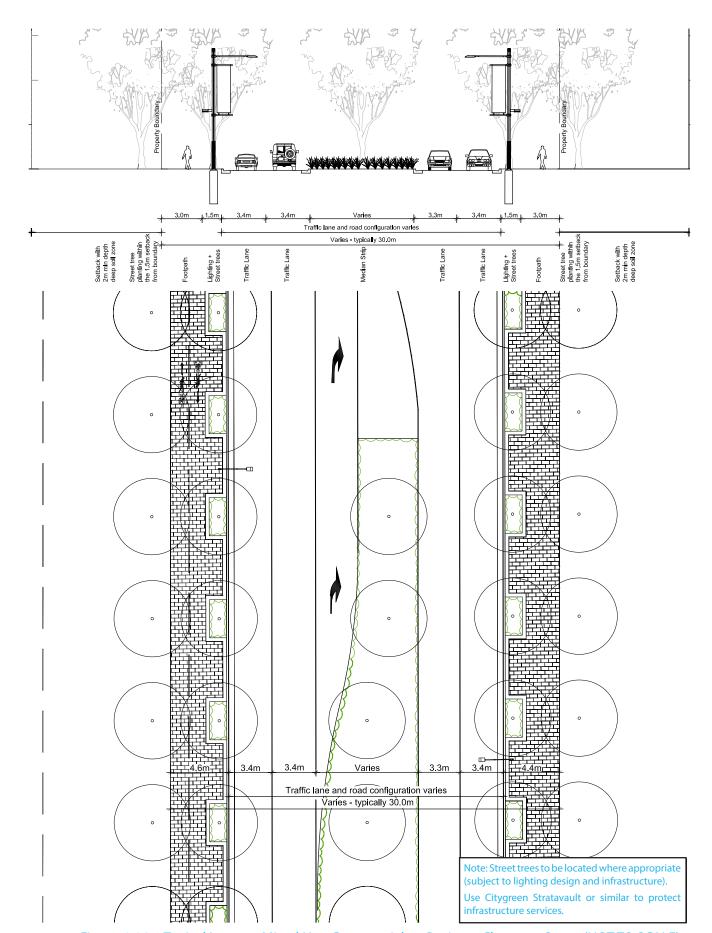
Typical Layout - Mixed Use, Commercial, or Business Character Street (NOT TO SCALE) e.g. Waterloo Road - Typically 30 metres wide
